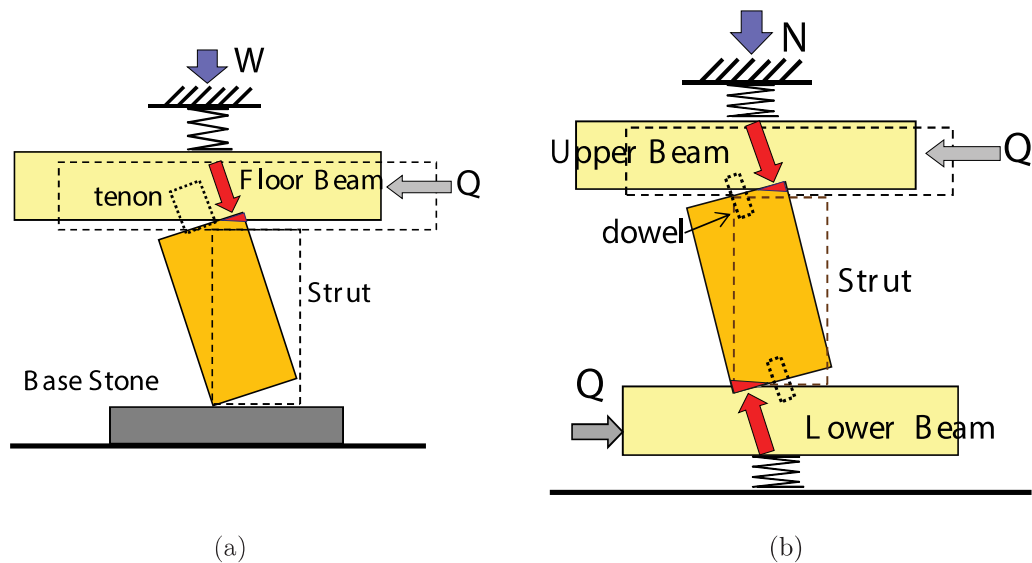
Strut type joint: a) detail of mechanism A; b) detail of mechanism B (Tanahashi and Suzuki, 2016).
